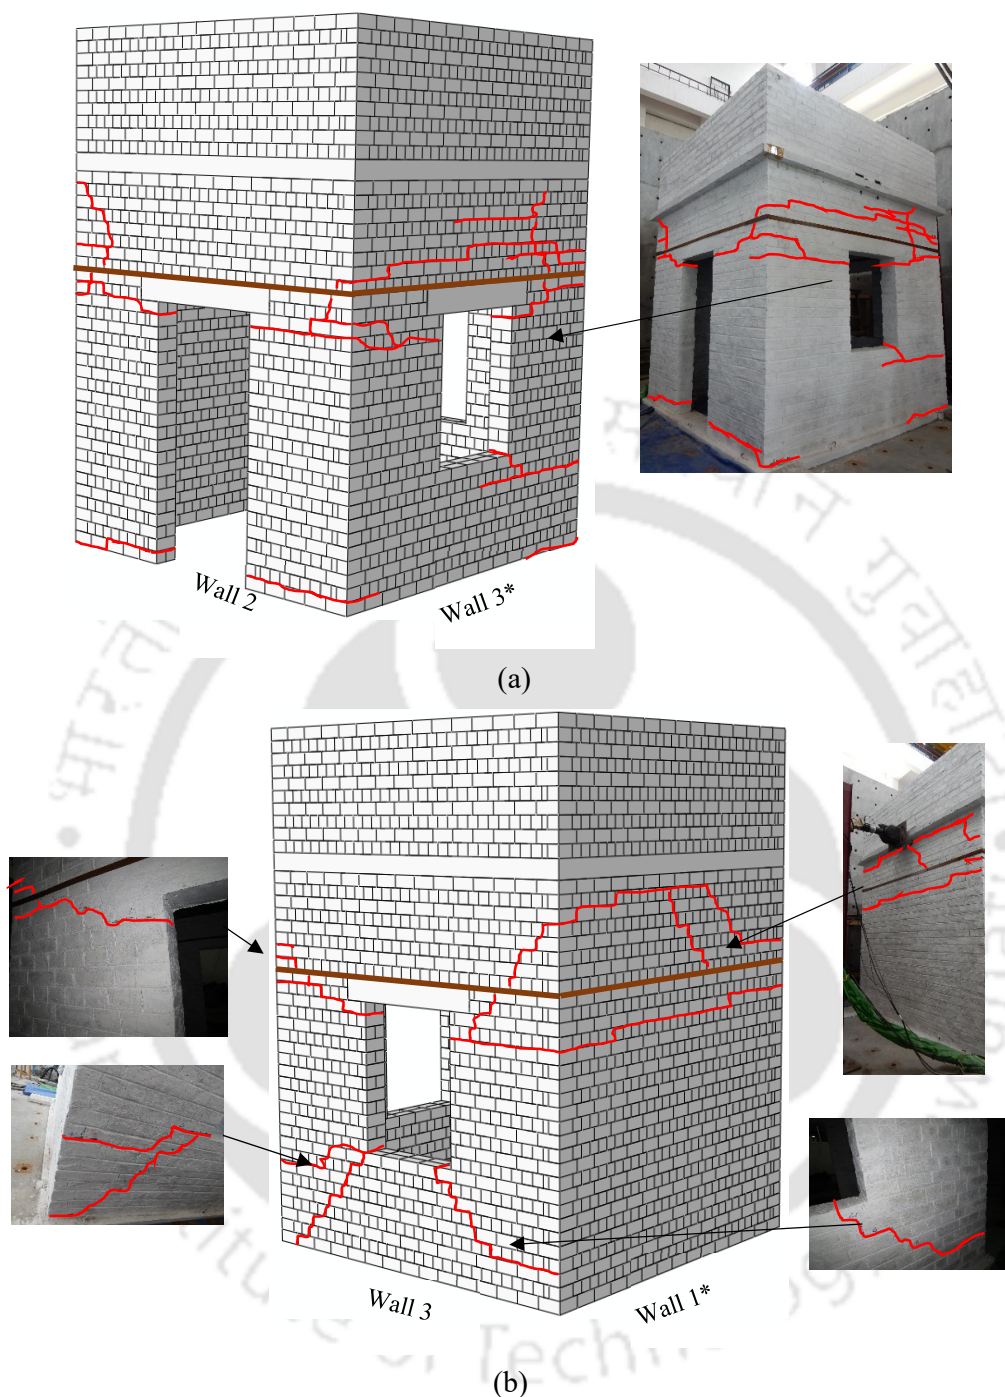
Damage observed in different walls during testing of the strengthened building 1 (Model 1): (a) Wall 2 and Wall 3*, and (b) Walls 3 and 1*.
